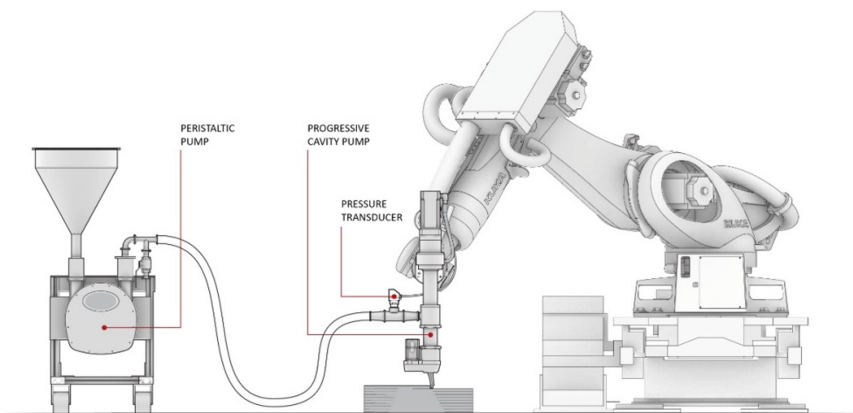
3DCP system consisting of supply pump and robotically positioned extrusion head.
